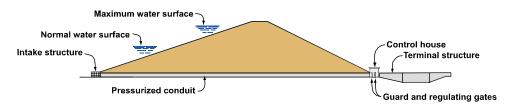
Arrangement 4—Downstream control.—The control feature is located at the downstream end of the conduit.
